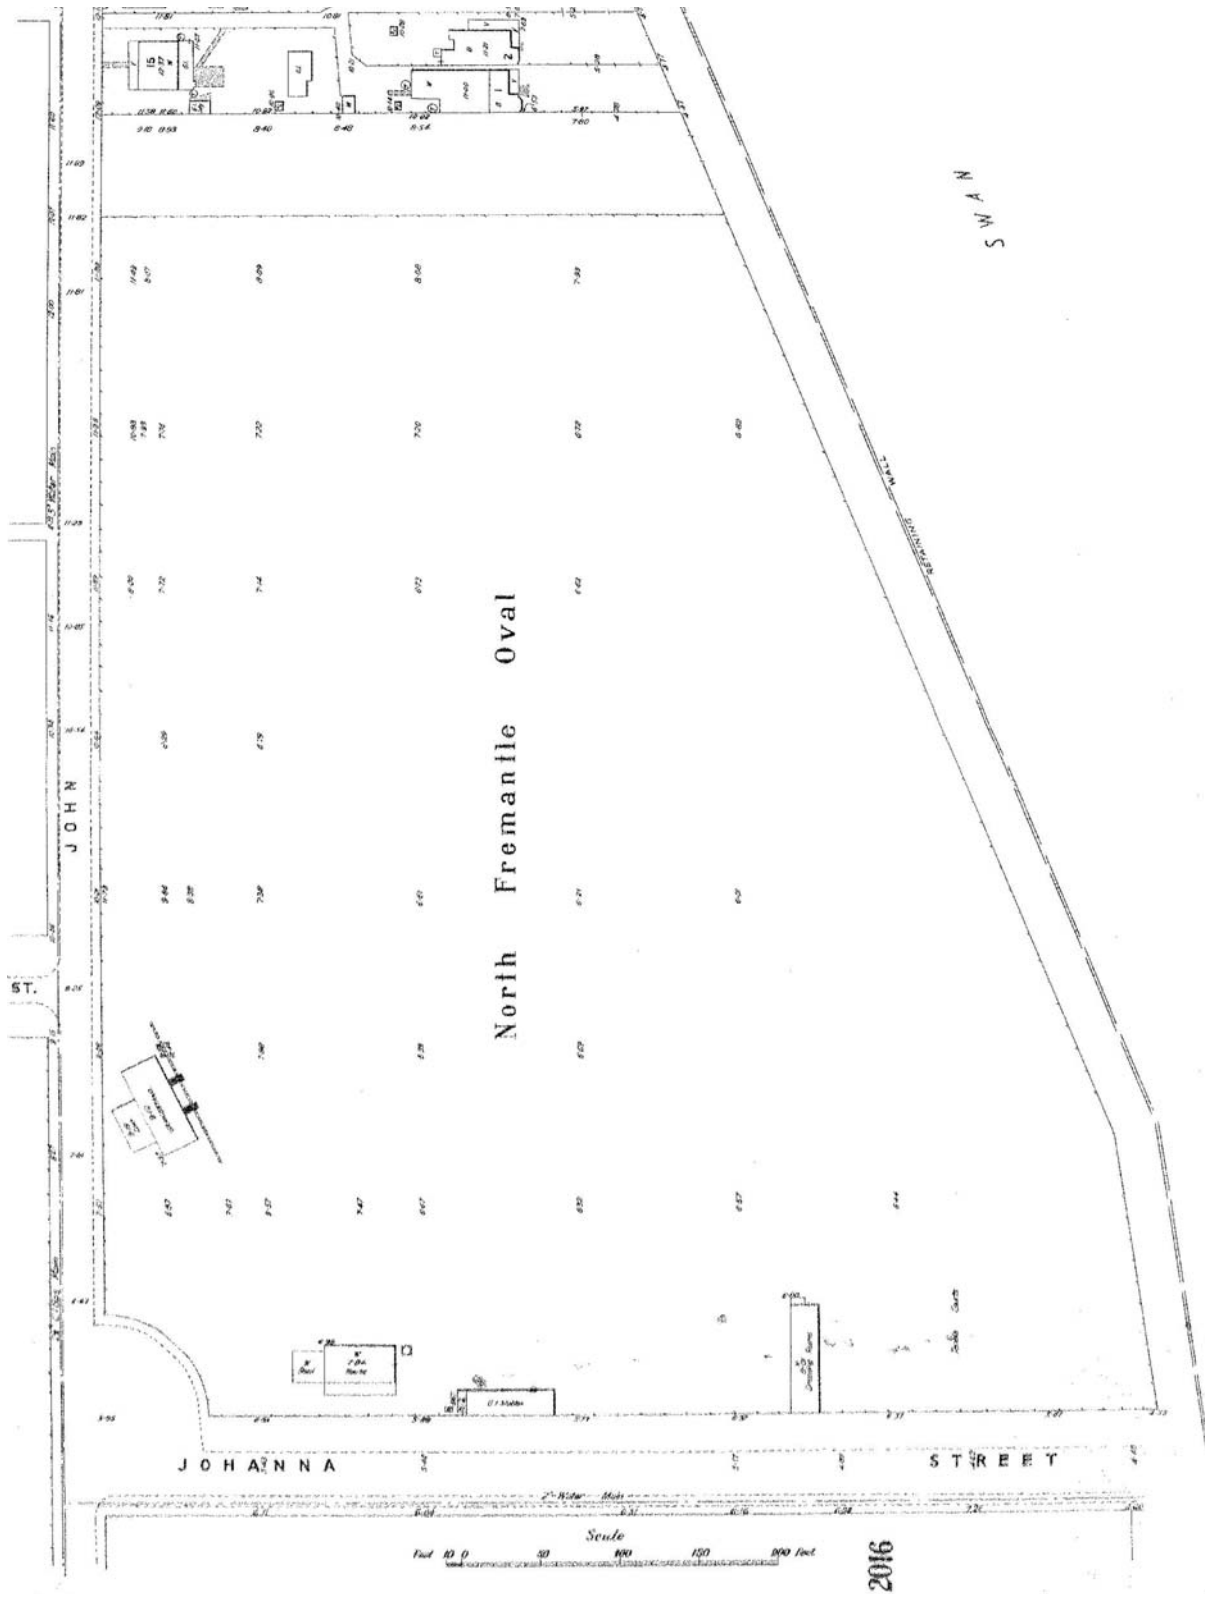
MWSS & DD Sewerage Plan 2107, 1939
